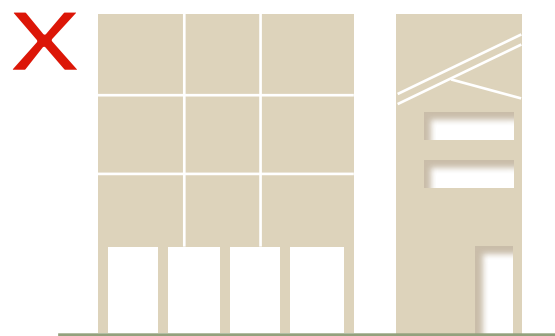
Very large openings at base, thin columns, blank, non-integral facades, facades not respecting privacy, should be avoided
